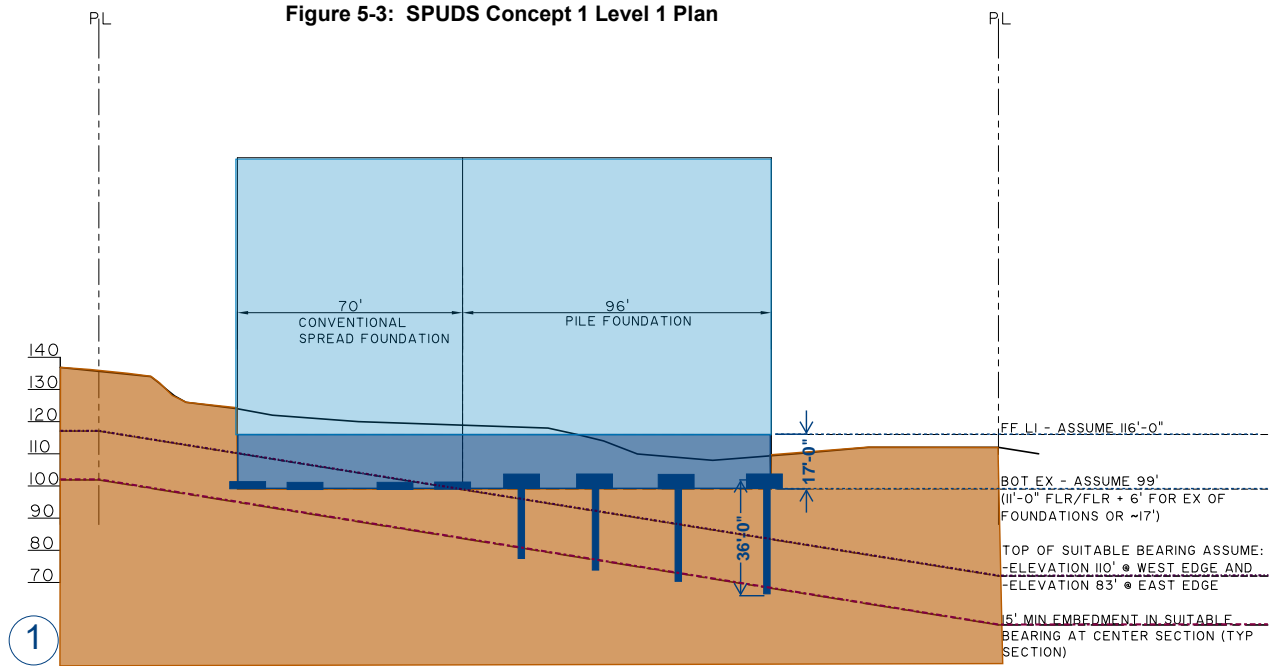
SPUDS Concept 1, Section 1 Through West Building Excavation, Looking North
